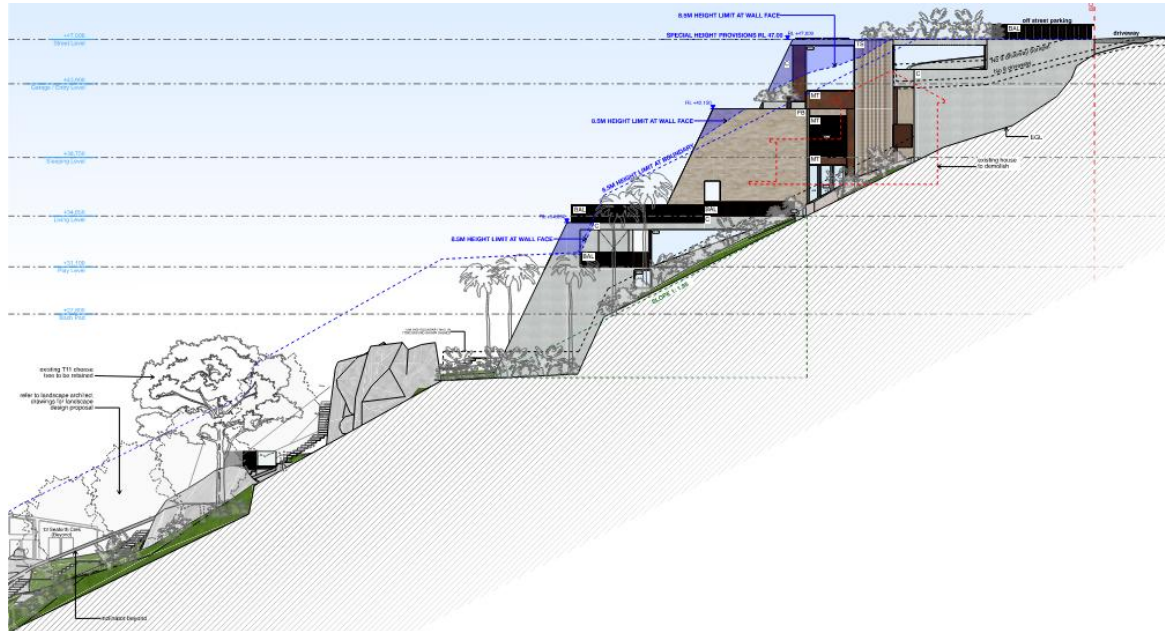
eastern elevation. The blue shaded areas denote the location and extent of proposed building height exceptions
